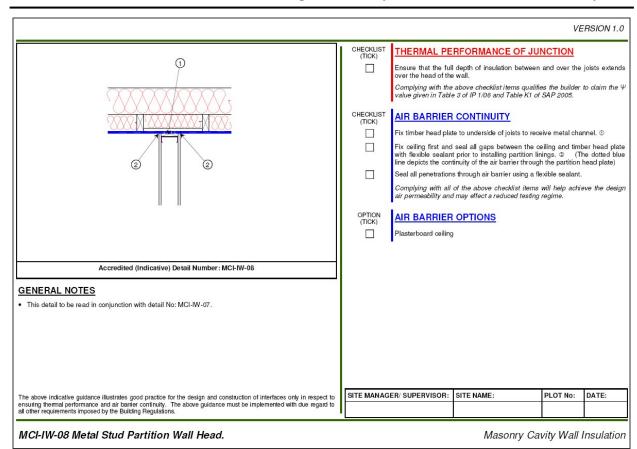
Accredited Construction Detail MCI-IW-08 (DCLG 2007).
